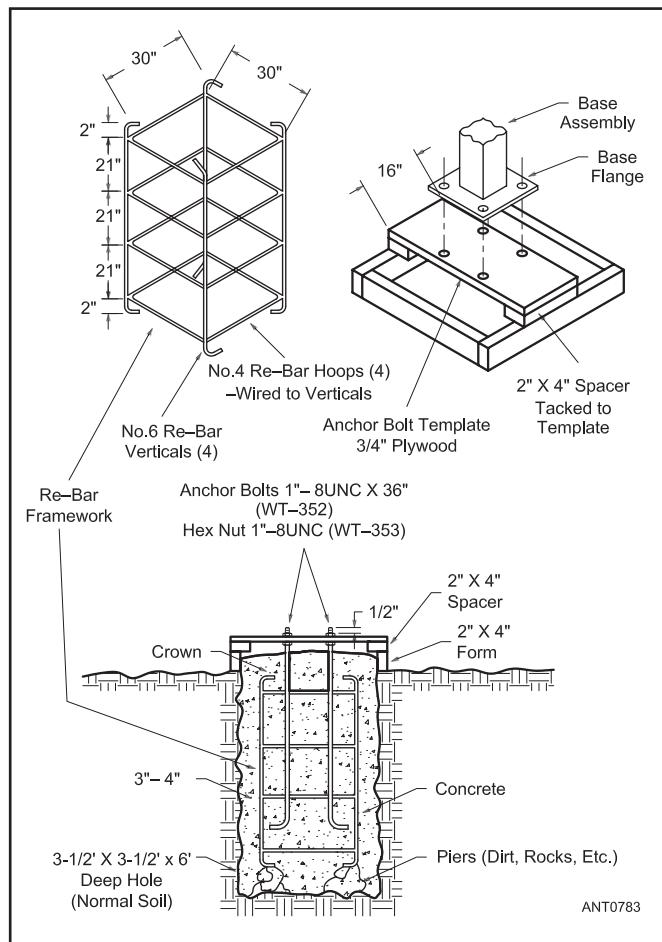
Plans for installing concrete base for a 70-foot tubular crank-up tower. Although the instructions vary from tower to tower, this is representative of the type of concrete base specified by most manufacturers.
